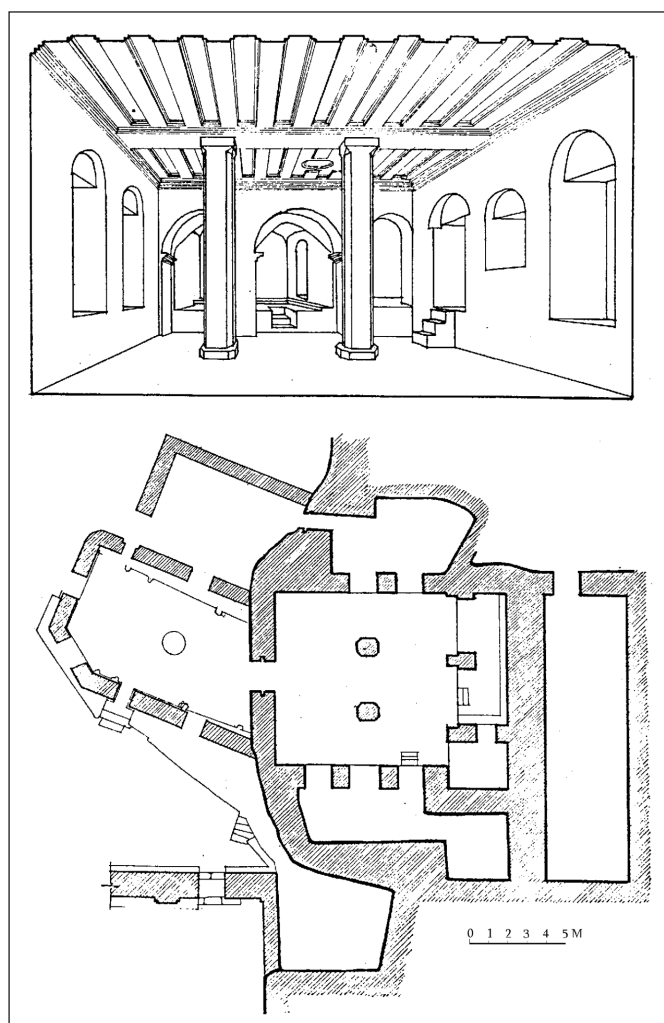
The Plan and interior of the rock-cut hall of Uplistsikhe (drawing B. Gabekhadze).
